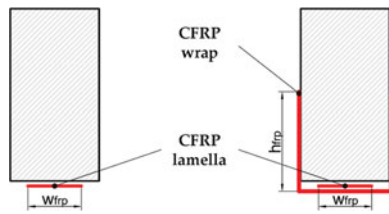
Reinforcement layouts. Left-hand side: LR. Right-hand side: BR.
